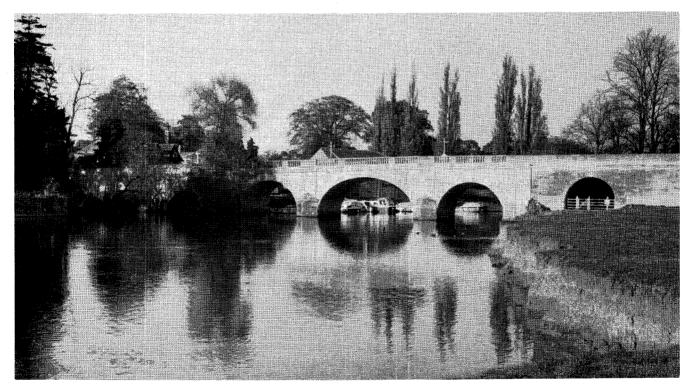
Right bank below Wallingford Bridge in 1980 showing extensive bank erosion
